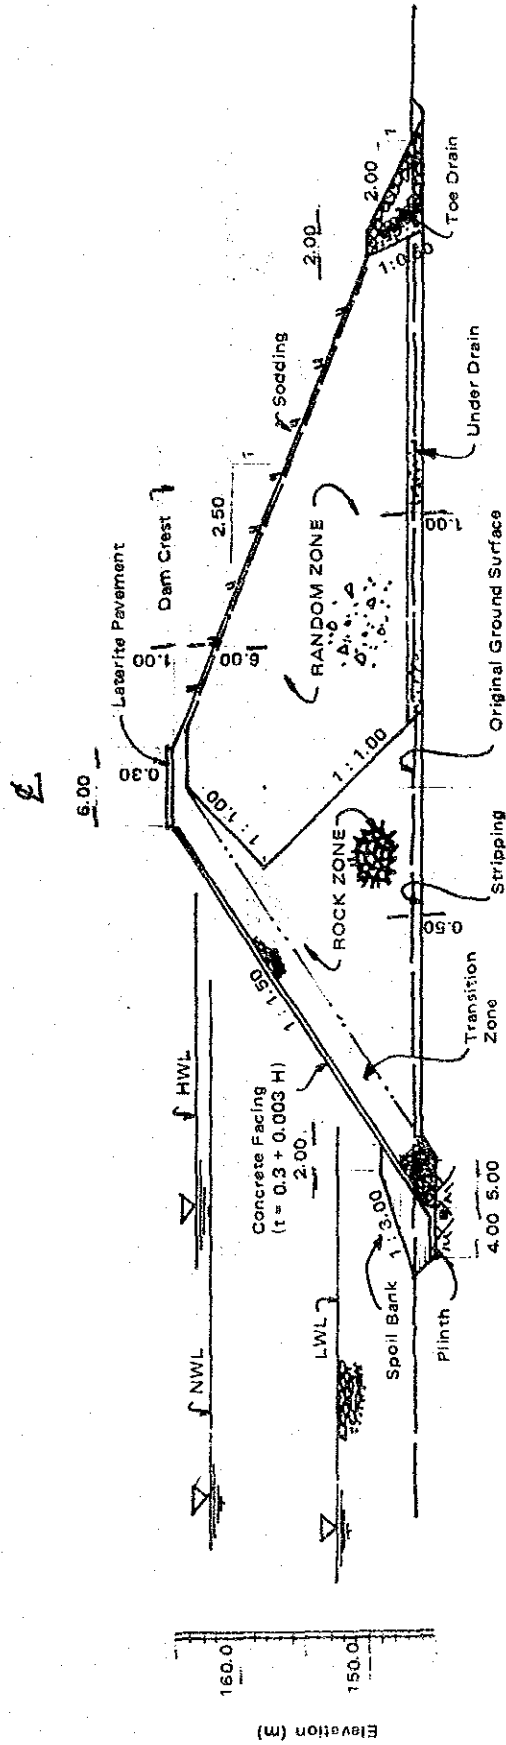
TYPICAL SECTION OF EACH TYPE DAM (2/4)
